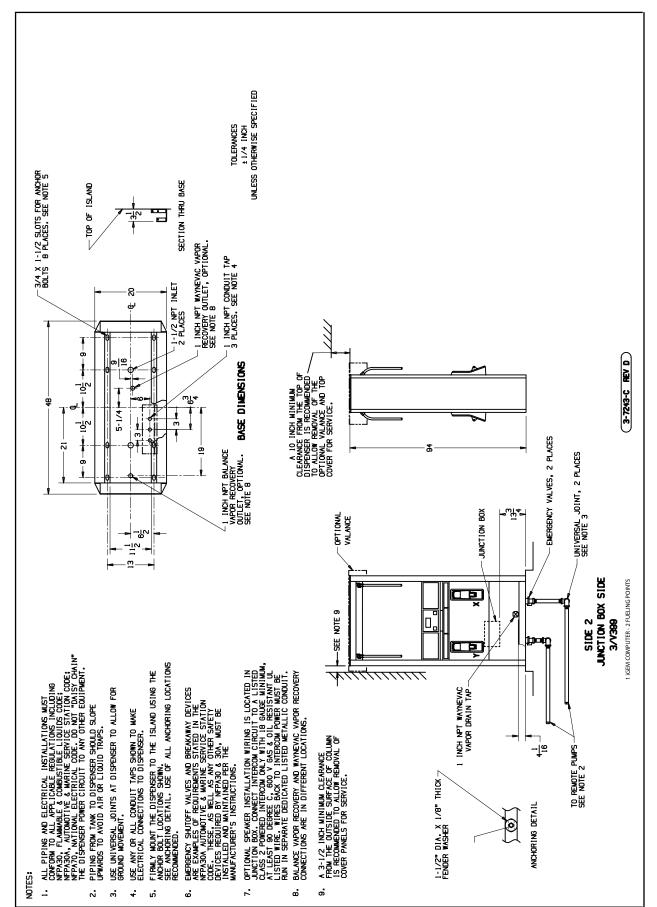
3-7243-C Installation Instructions - 4/V399D (Remote)
